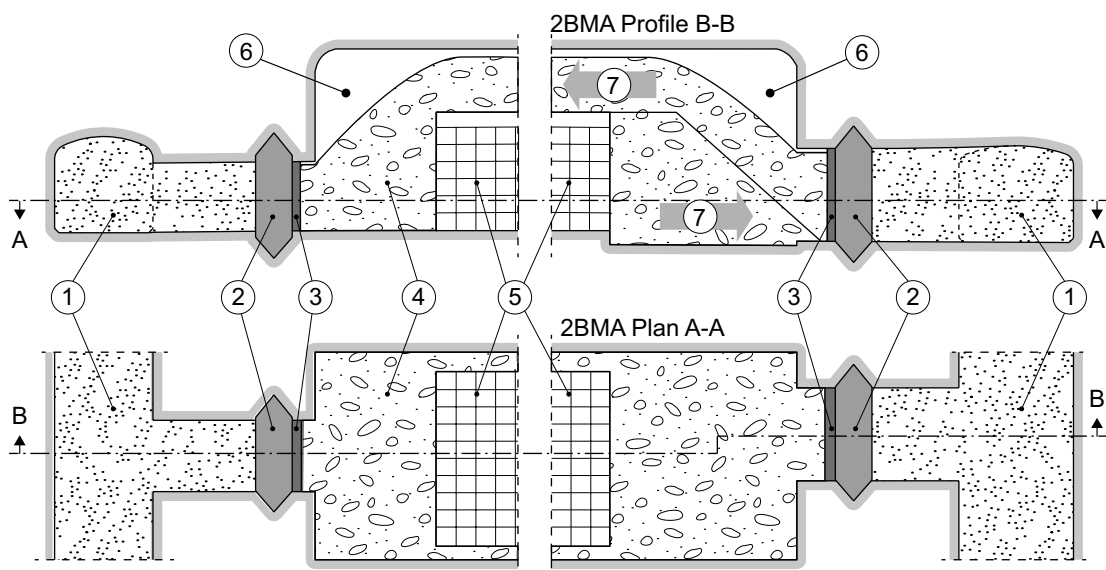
Schematic profile and plan of 2BMA after closure. Key to numbering: 1) Bentonite 2) Mechanical plug of concrete 3) Constraining wall and concrete form 4) Macadam 5) Grouted waste packages 6) Open gap between top surface of macadam and tunnel roof 7) Working direction for backfilling of waste vault.
